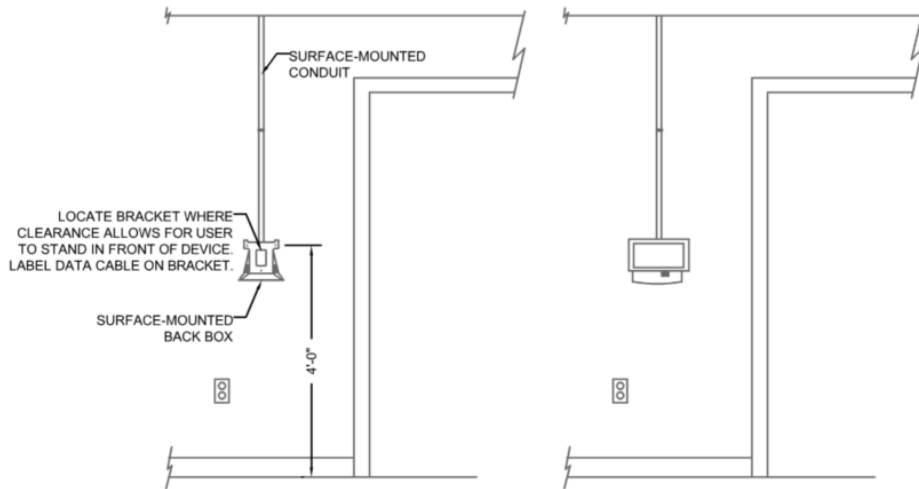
15 00-03 Bio Clock Mounting Detail – Surface Mount
